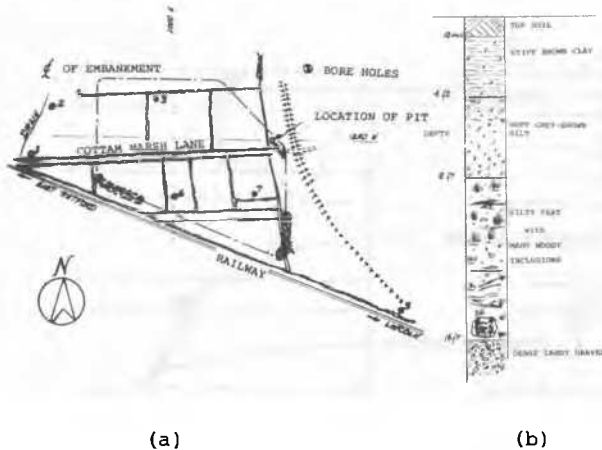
(a) Plan of the site showing boreholes and trial pit.
